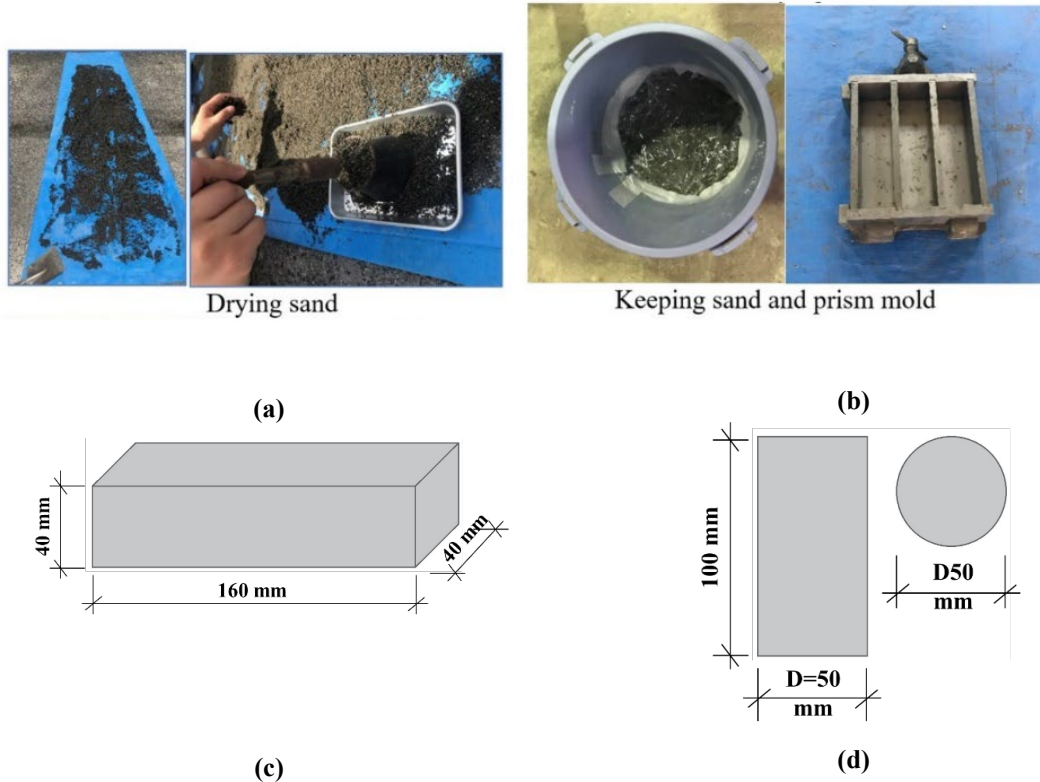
(a) Drying sand; (b) mold; (c) prism specimen; (d) cylinder specimen
